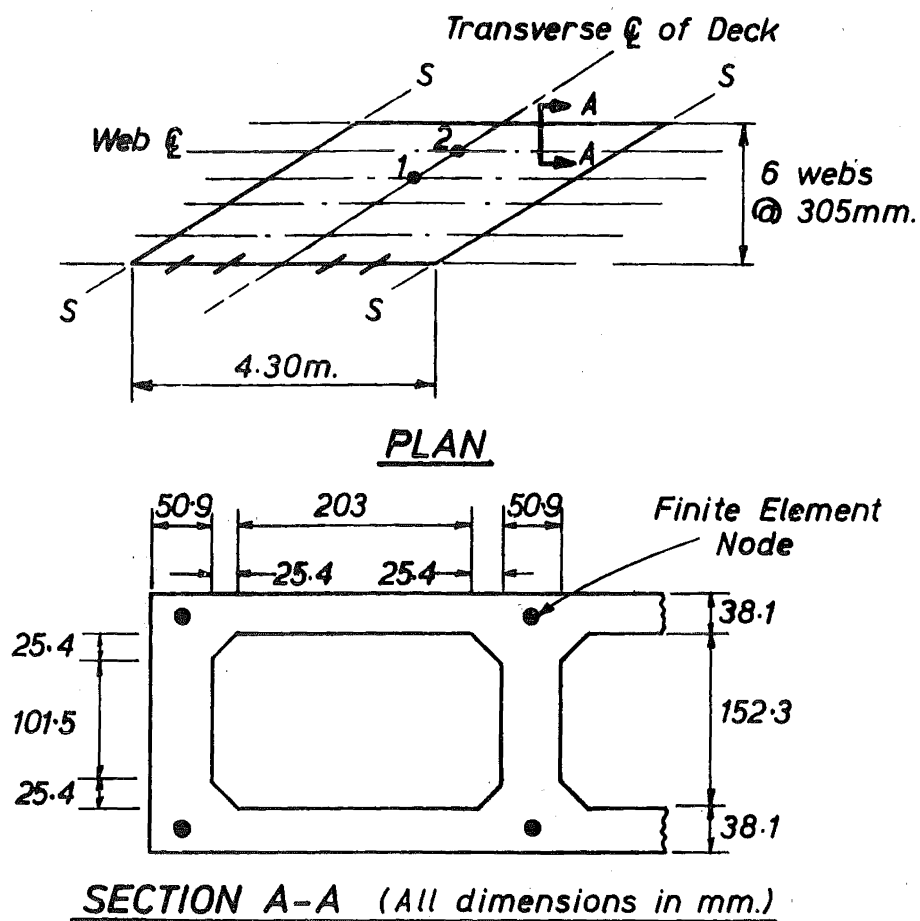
DETAILS OF SKEW CELLULAR BRIDGE MODEL
